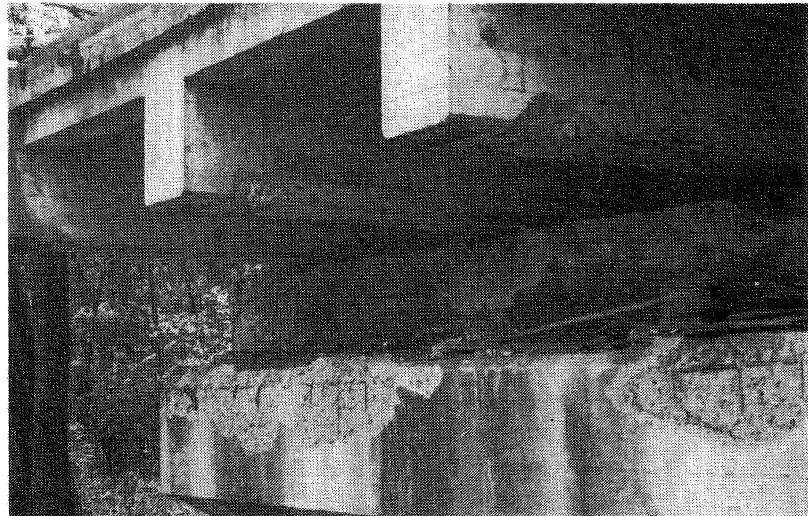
Dagupan City; common pier to support steel girder and concrete beams
